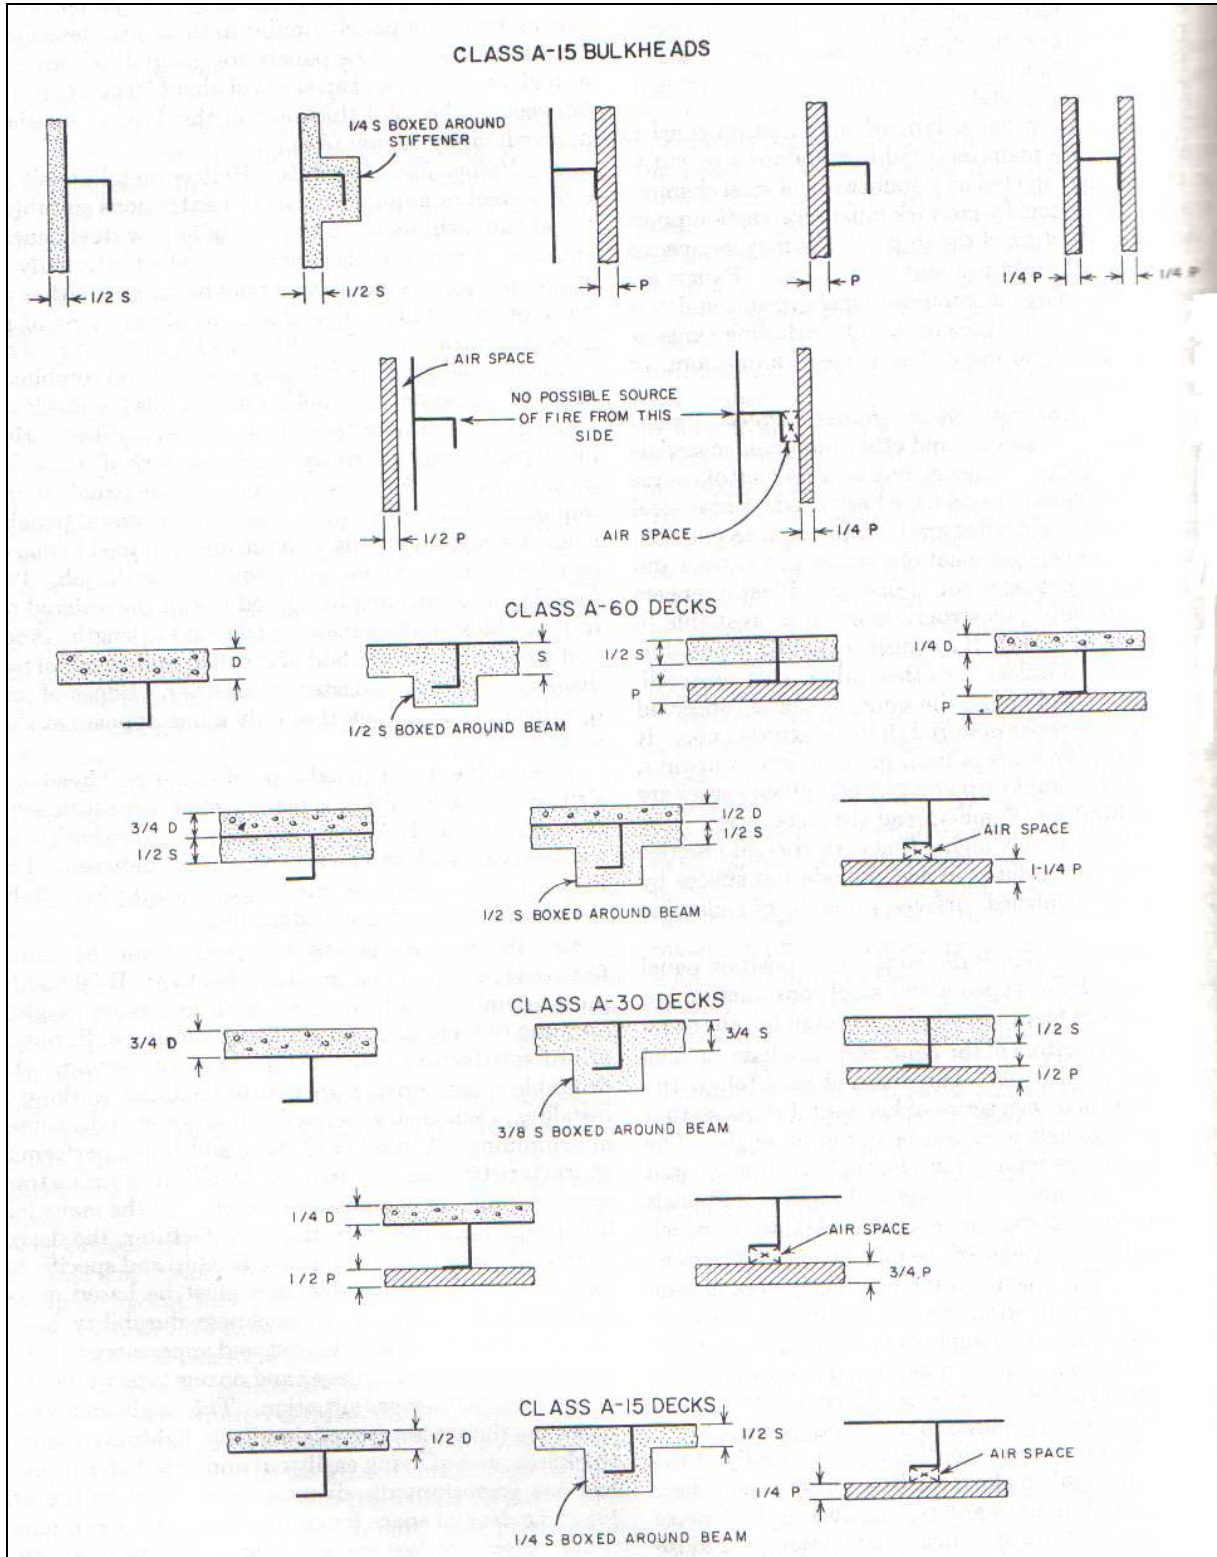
a – Application of insulation, linings, ceilings, and deck coverings to Class A fire divisions.
